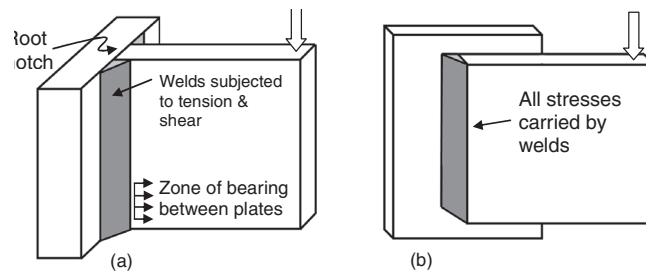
Welded connection subjected to (a) out-of-plane eccentric load and (b) in-plane eccentric load.
